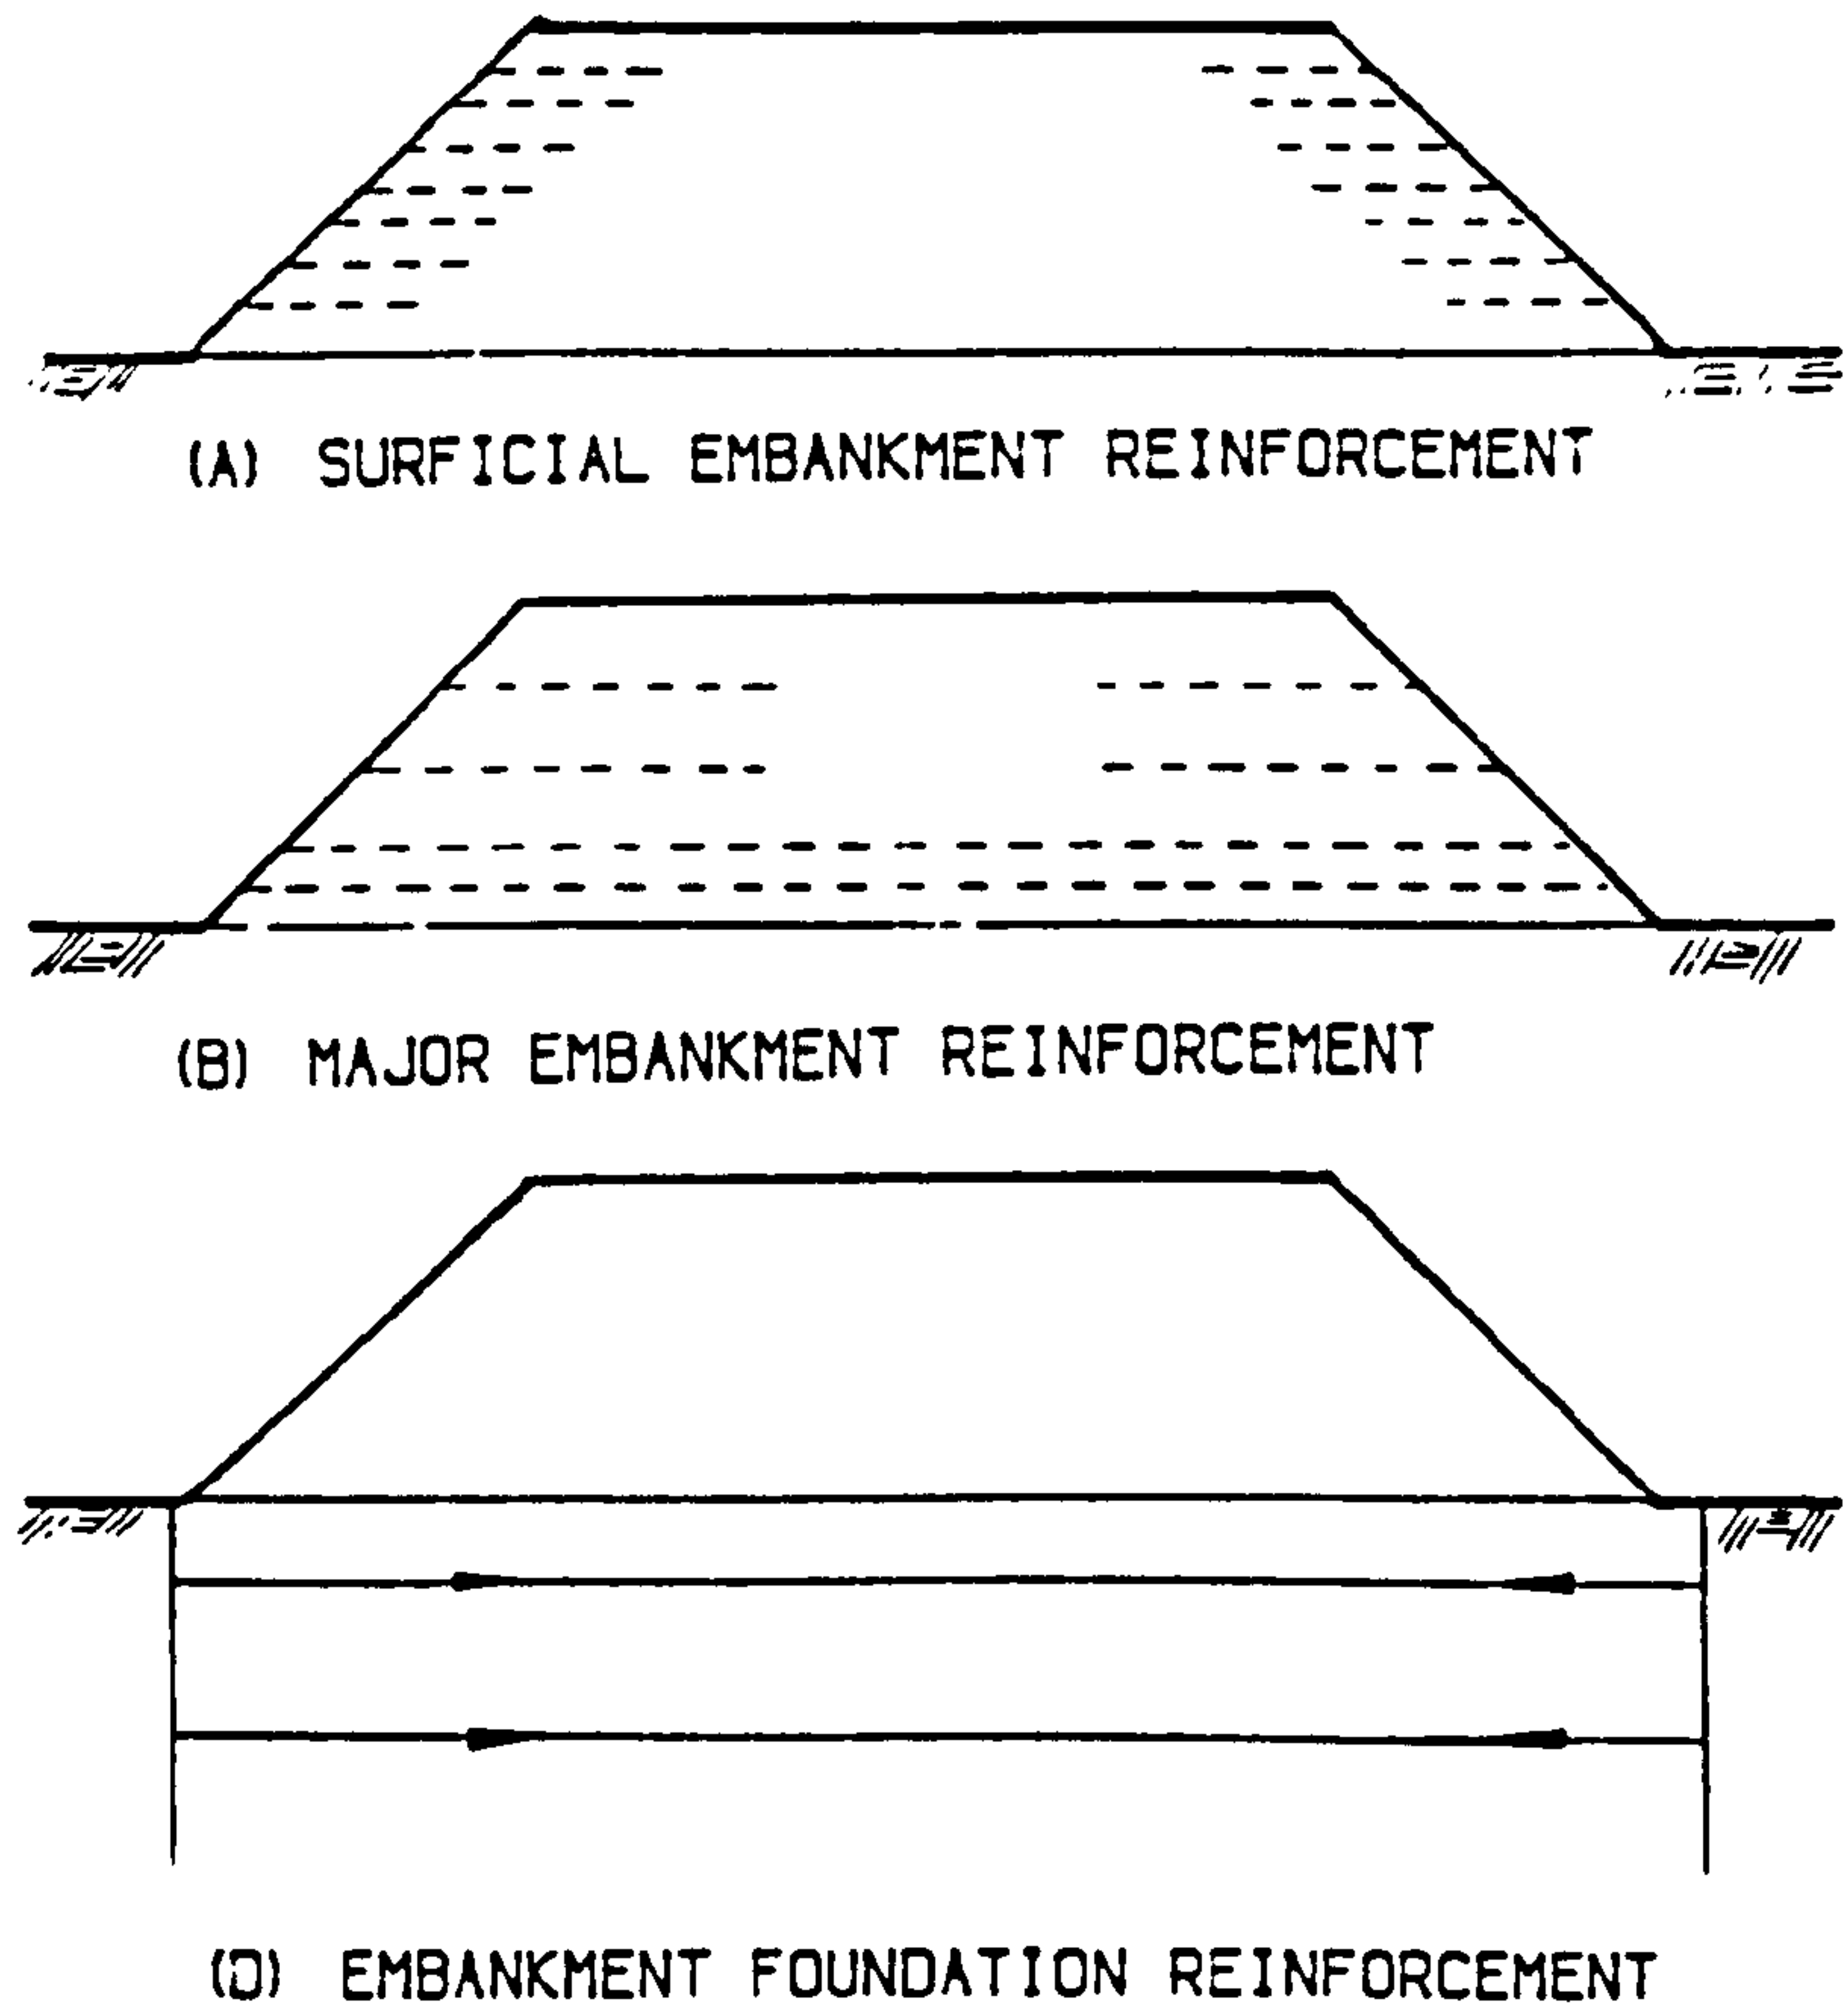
A) MODES OF EMBANKMENT REINFORCEMENT (AFTER INGOLD, 1982).
